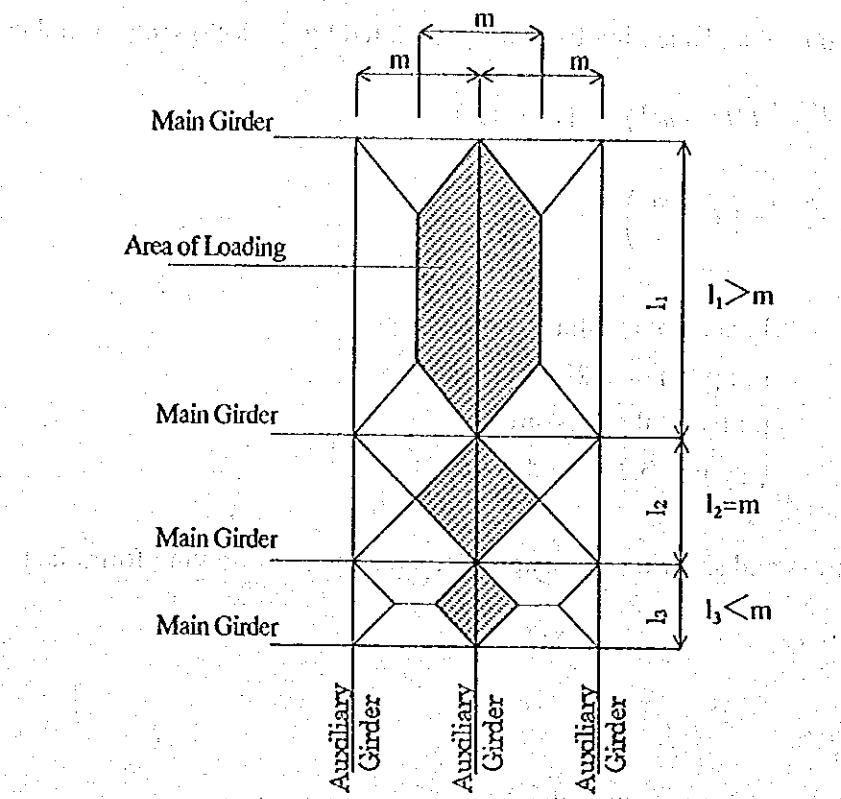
Area of Loading for Auxiliary Girders
